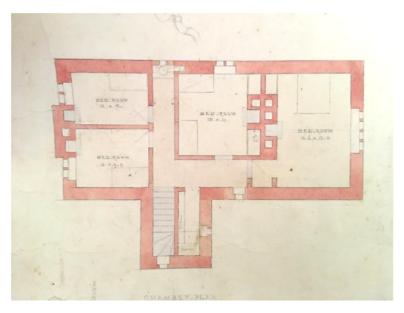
First floor plan of The Lodge House by Bucknell (1871)
